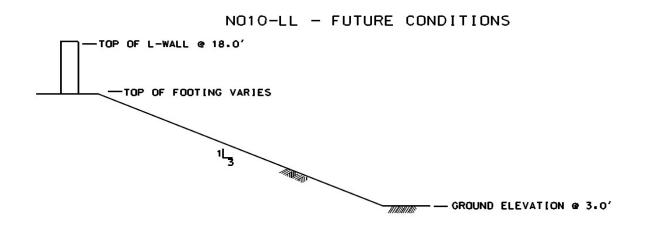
Typical Levee Design Cross-sections Topaz Street Levee/Floodwall Combination (NO10-LL)
